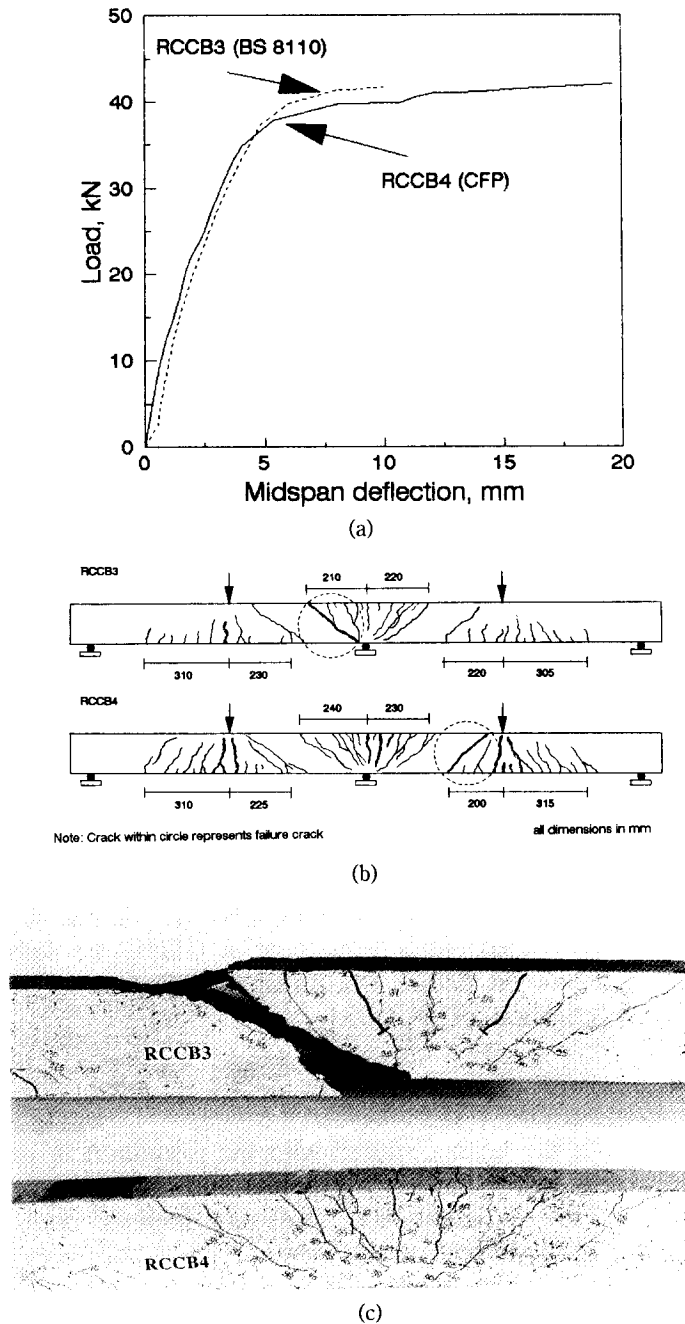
Performance of the RC continuous beams tested: (a) Load-midspan deflection curves; (b) extent of cracking and orientation of failure crack; (c) crack pattern at central support zone after failure.
